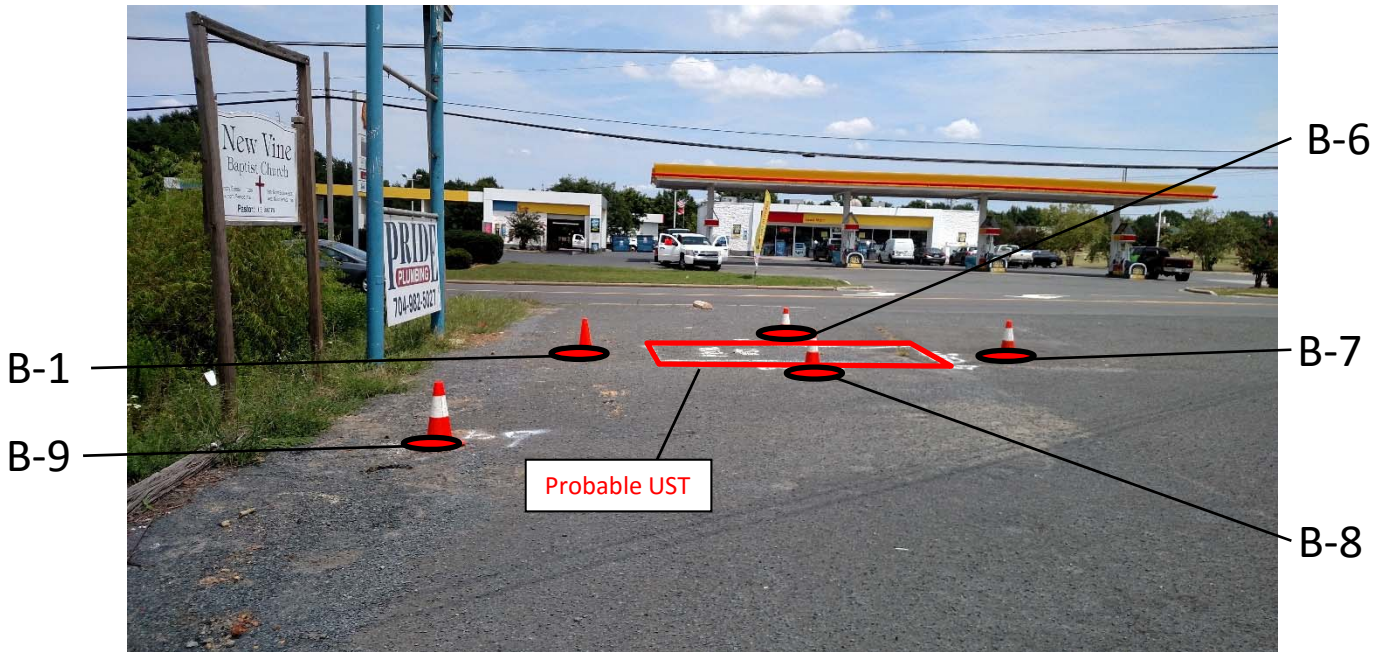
Boring locations B-1, B-6 through B-9, and a probable UST located west of the retail store front, facing northeast.
